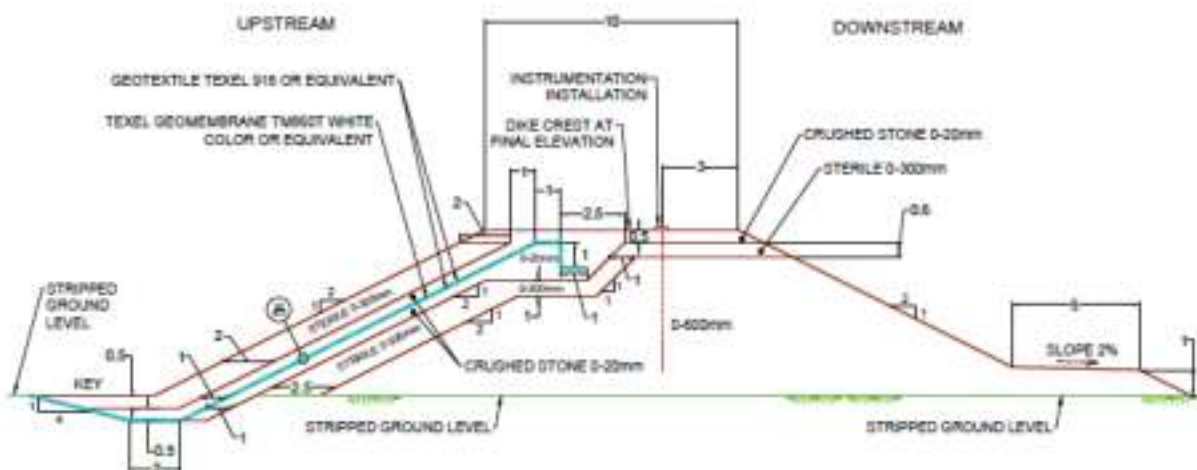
Tailings Park Impermeable Dike Typical Section
